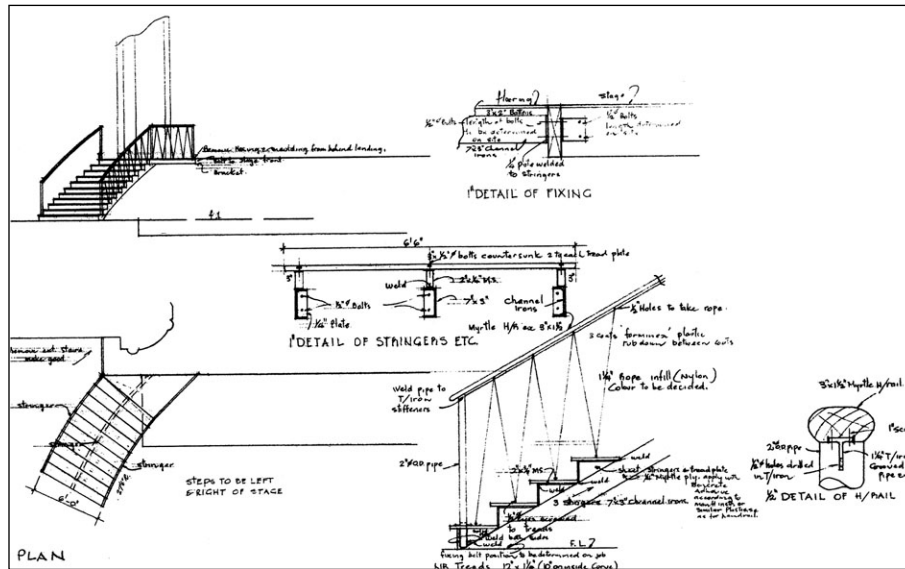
Plan of new stage steps installed in 1962-3 (HCC Drawing C2).
